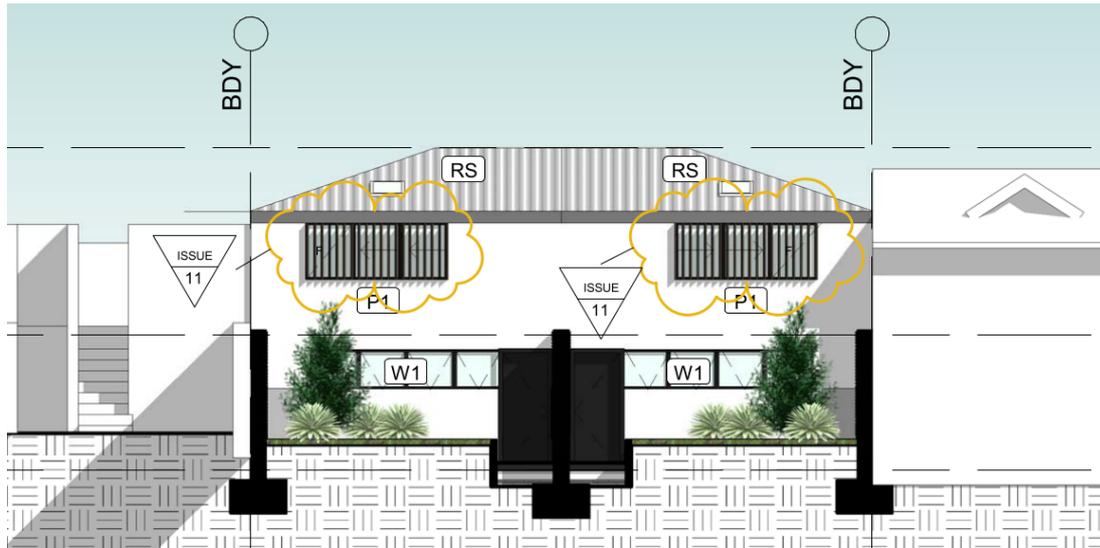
Rear elevation of the laneway structure (Internal view within the site)
